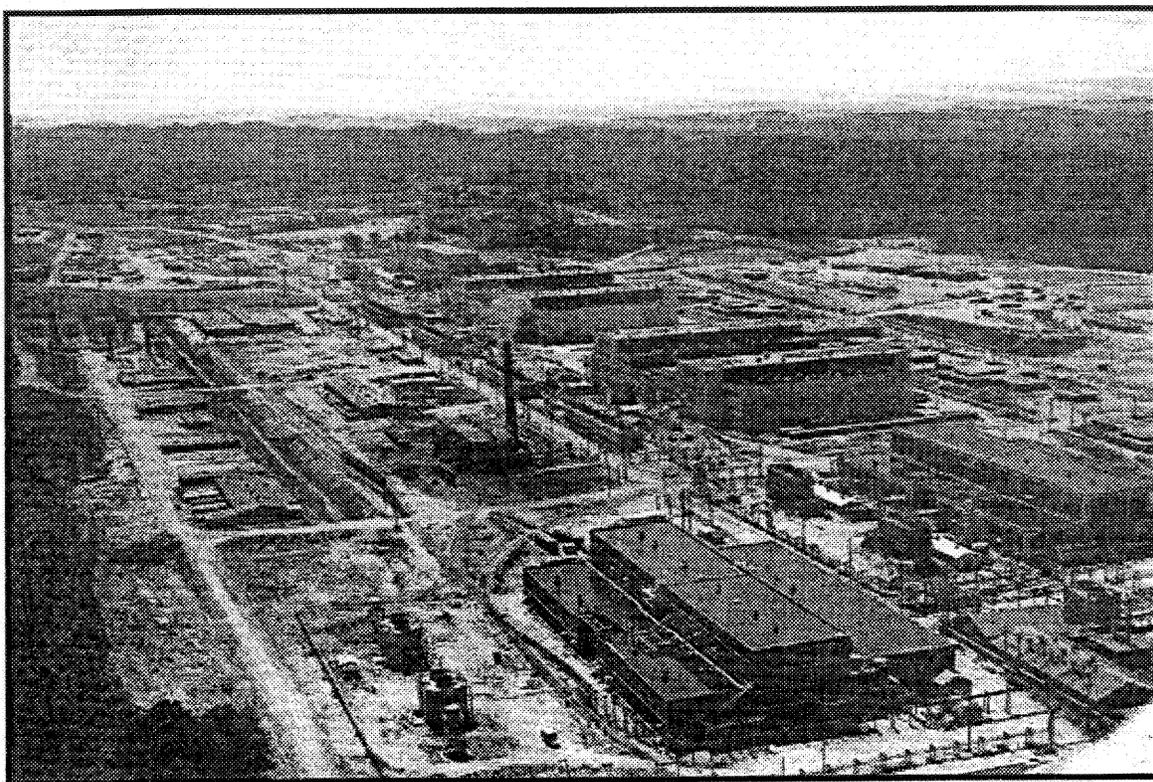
Y-12 Plant Construction, 1943 (*photo courtesy of AMSE*).
